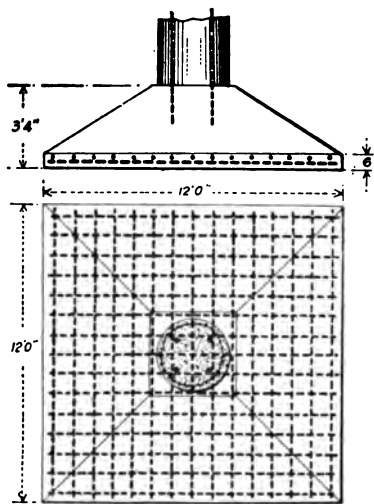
Column Footing, Robert Gair Factory, Brooklyn, N. Y.
